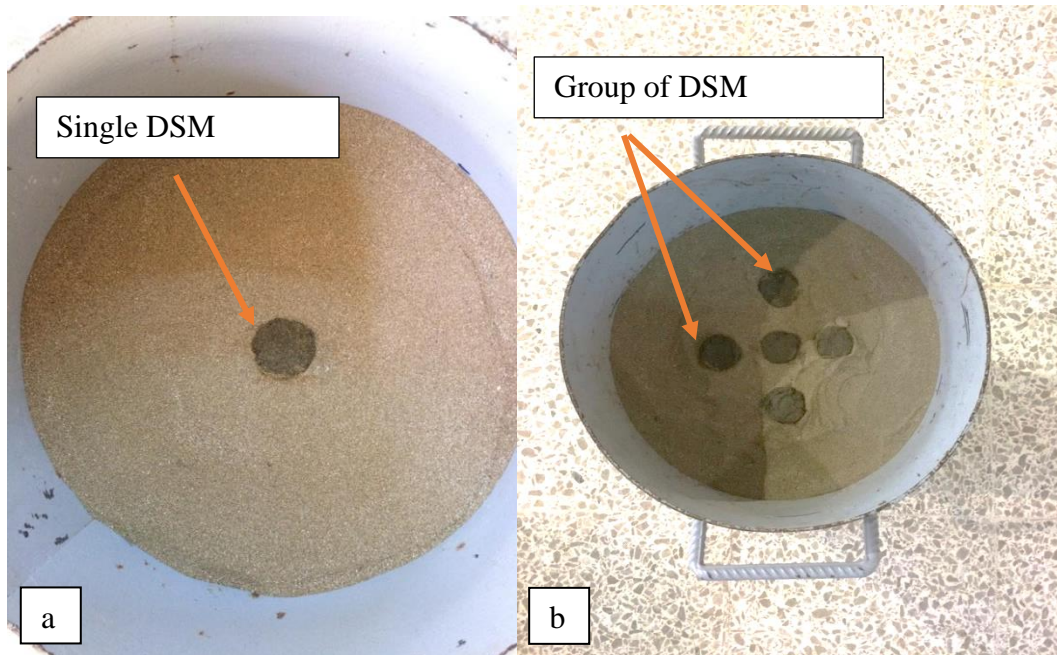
DSM column constructed in the test tank (a) single DSM column (b) group of DSM columns
